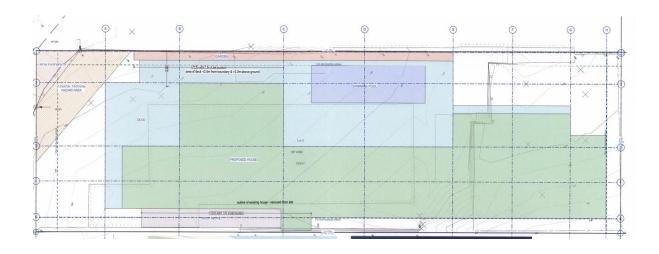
Proposed Site Plan (Source: Drawing Number: A101, dated 3/10/2020).
